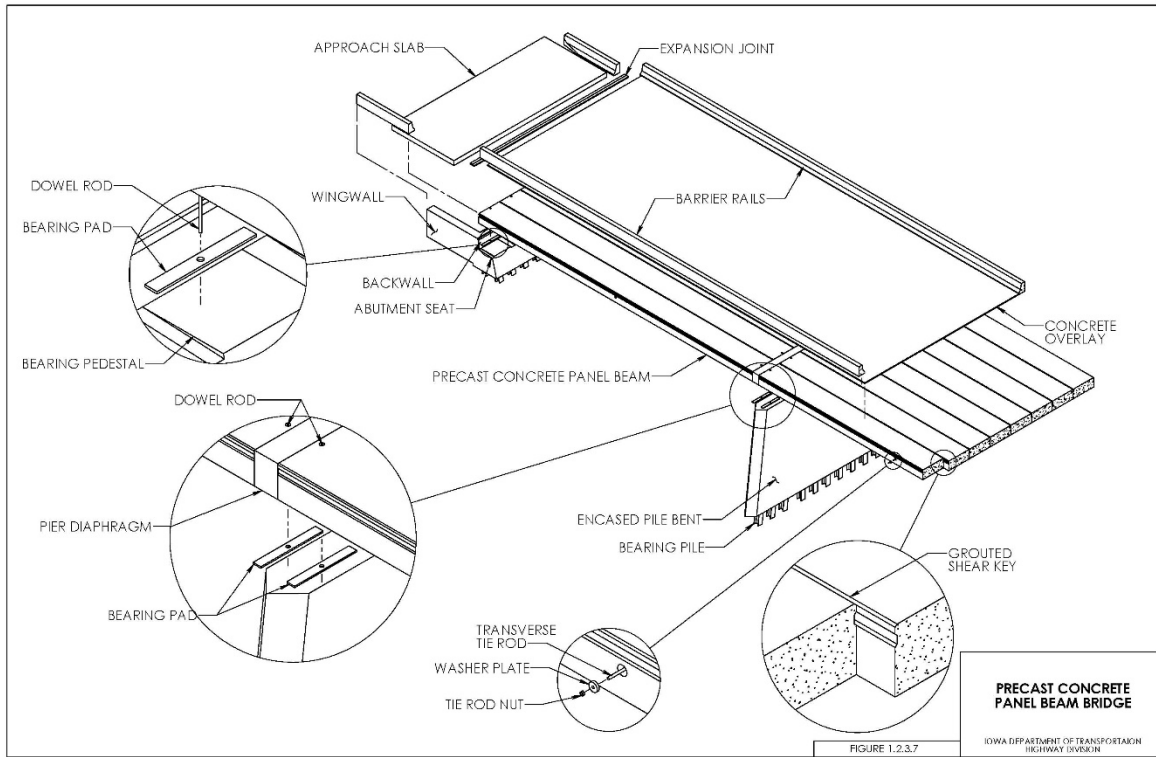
Precast Concrete Panel Beam Bridge Components
